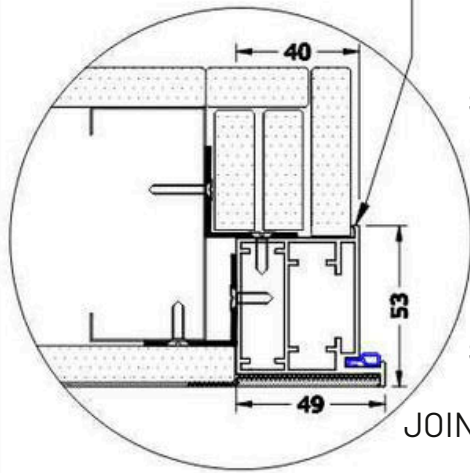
DETAIL WITH FLUSH FINISH TO BE PAINTED, TO BE USED WITHOUT SKIRTING BOARD OR WITH RECESSED SKIRTING BOARD.
